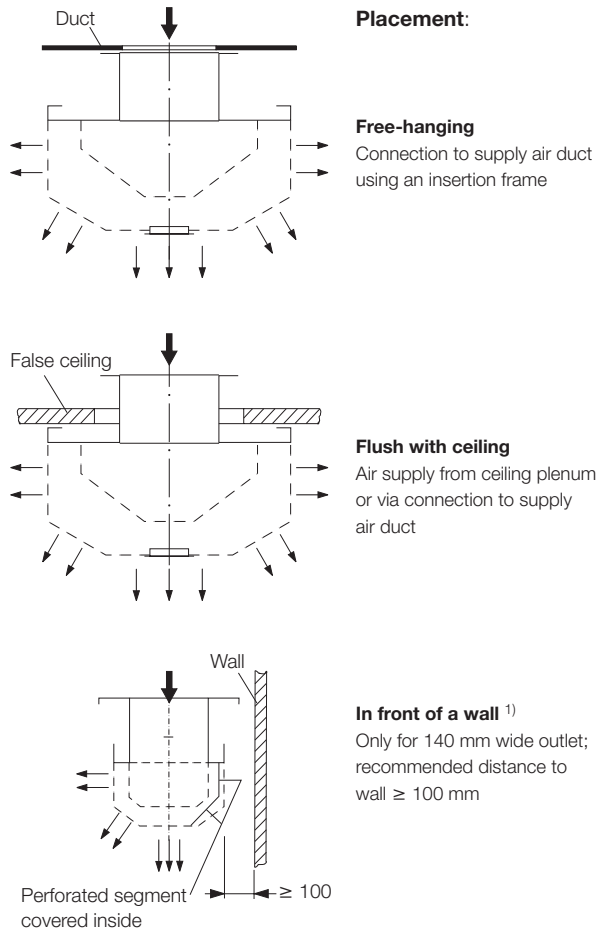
Trapezoidal displacement outlet - Placement and connection types
